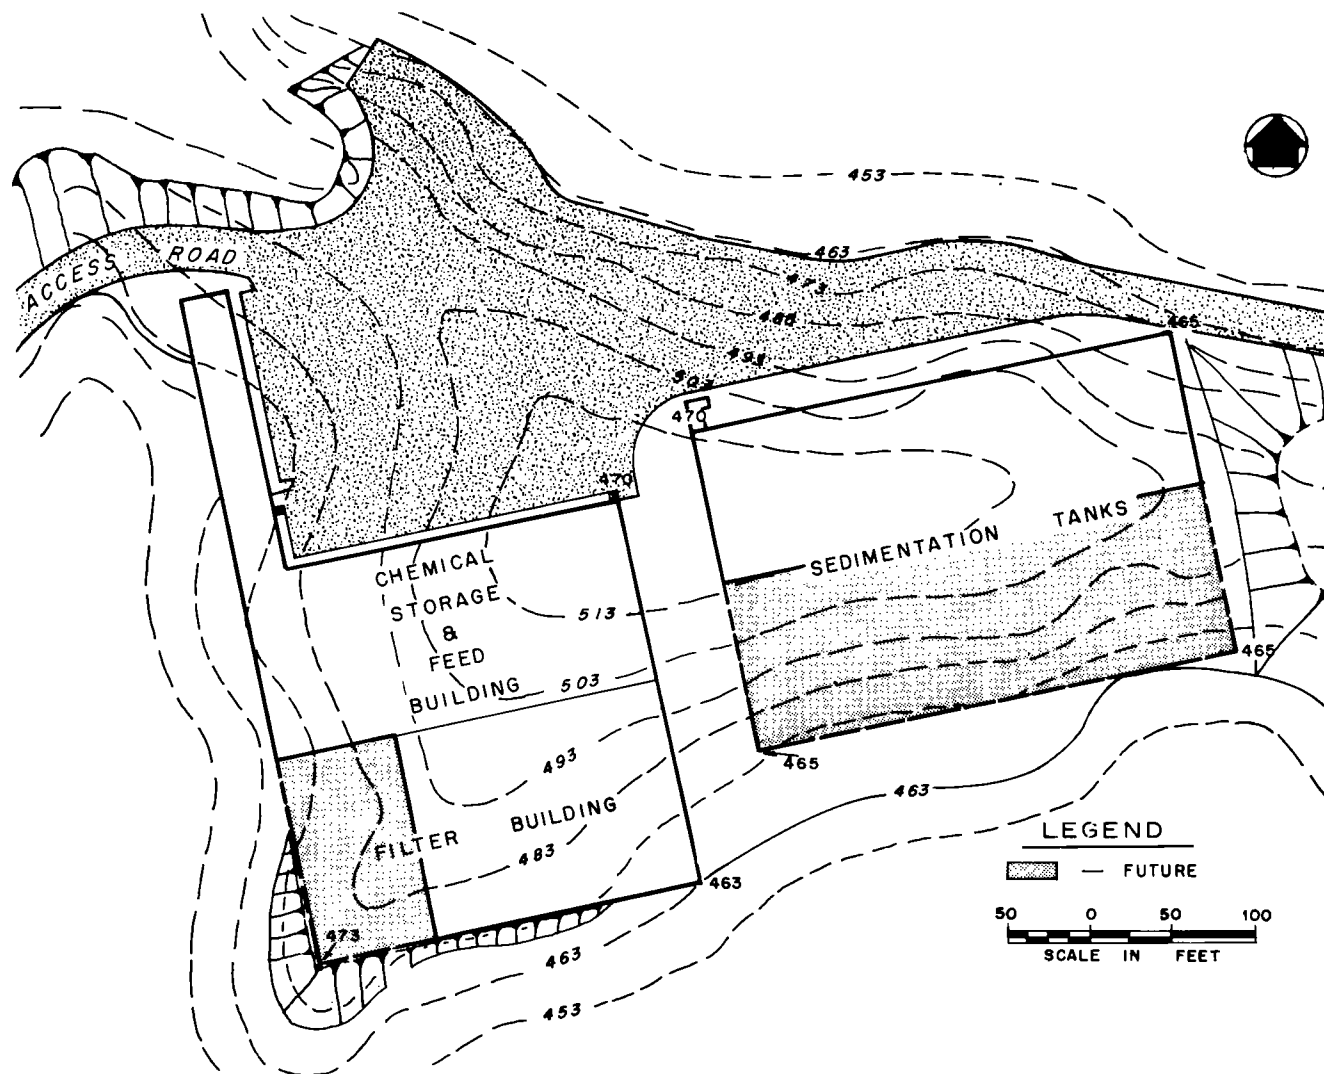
OROPOUCHE WATER TREATMENT – SITE PLAN
